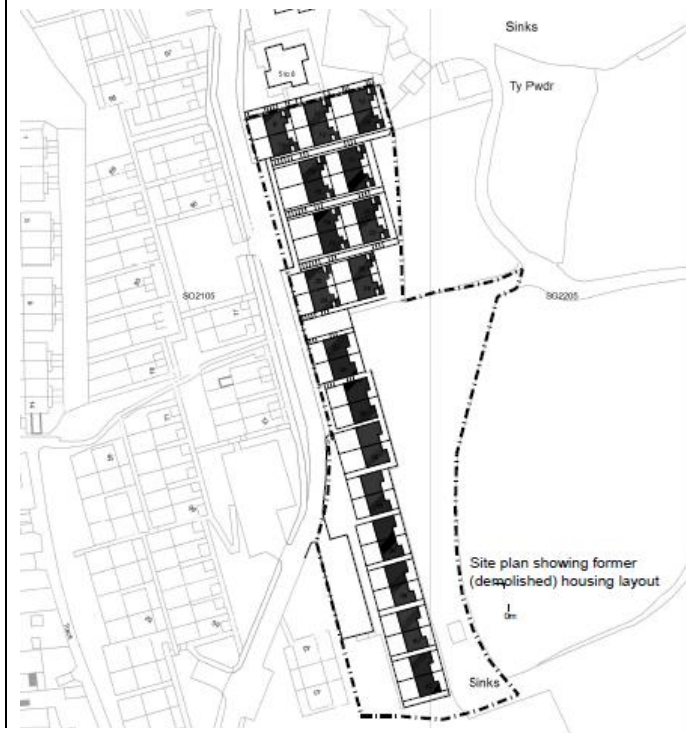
(above left): Site Layout of previous housing on the site prior to demolition.
